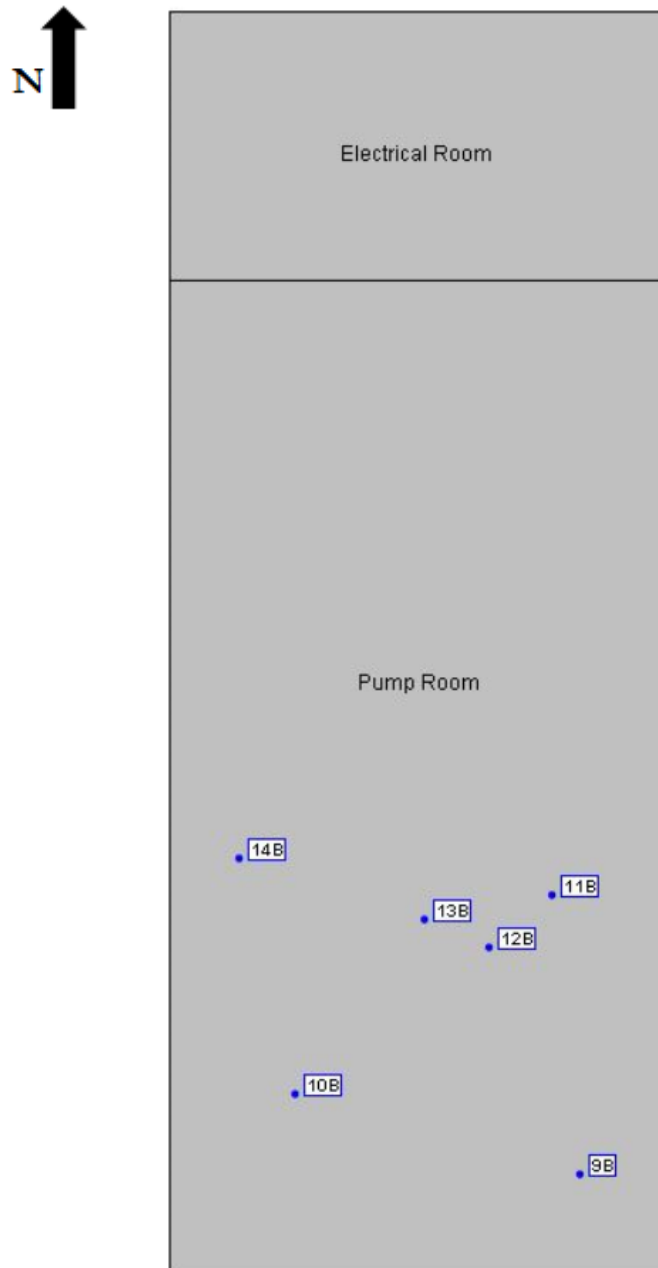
X-7726 Second Floor Utility Room Measurement Locations
